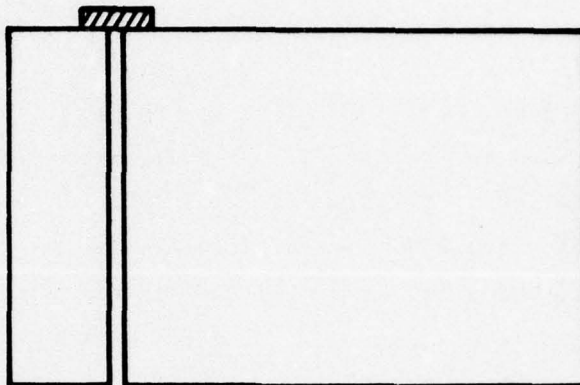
Test #4--Eccentric loading with single flat bearing anchor
